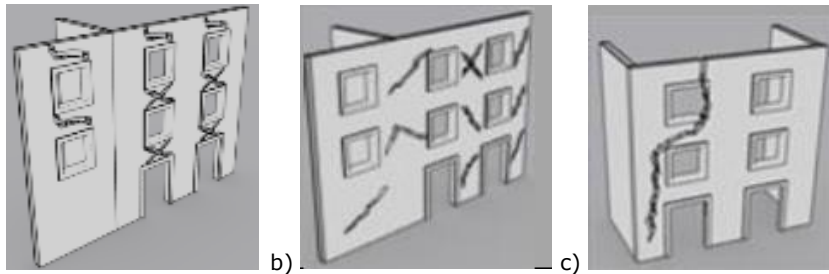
Most common in-plane failure mechanism due to shear forces for masonry buildings: a) damage to spandrels; b) damage to piers; c) global in-plane damage [191]
